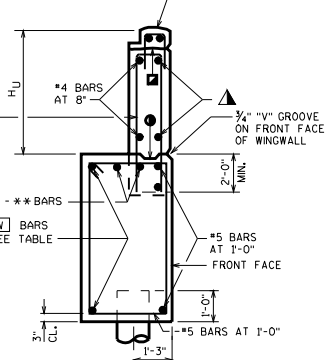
DETAIL FOR TYPE "LF", "HF", "PF", OR "SF" PARAPET SHOWN. SEE "TOP OF WING DETAILS" FOR OTHER RAILING & PARAPET TREATMENTS.
